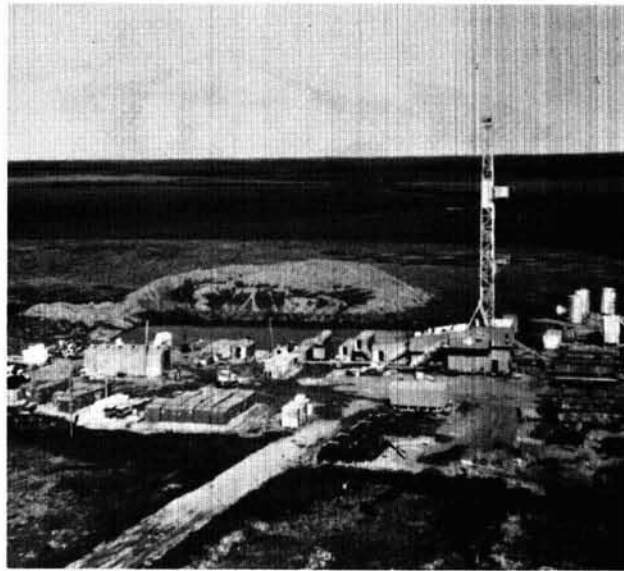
Gulf Oil Rig 15 location north of Parsons Lake.
